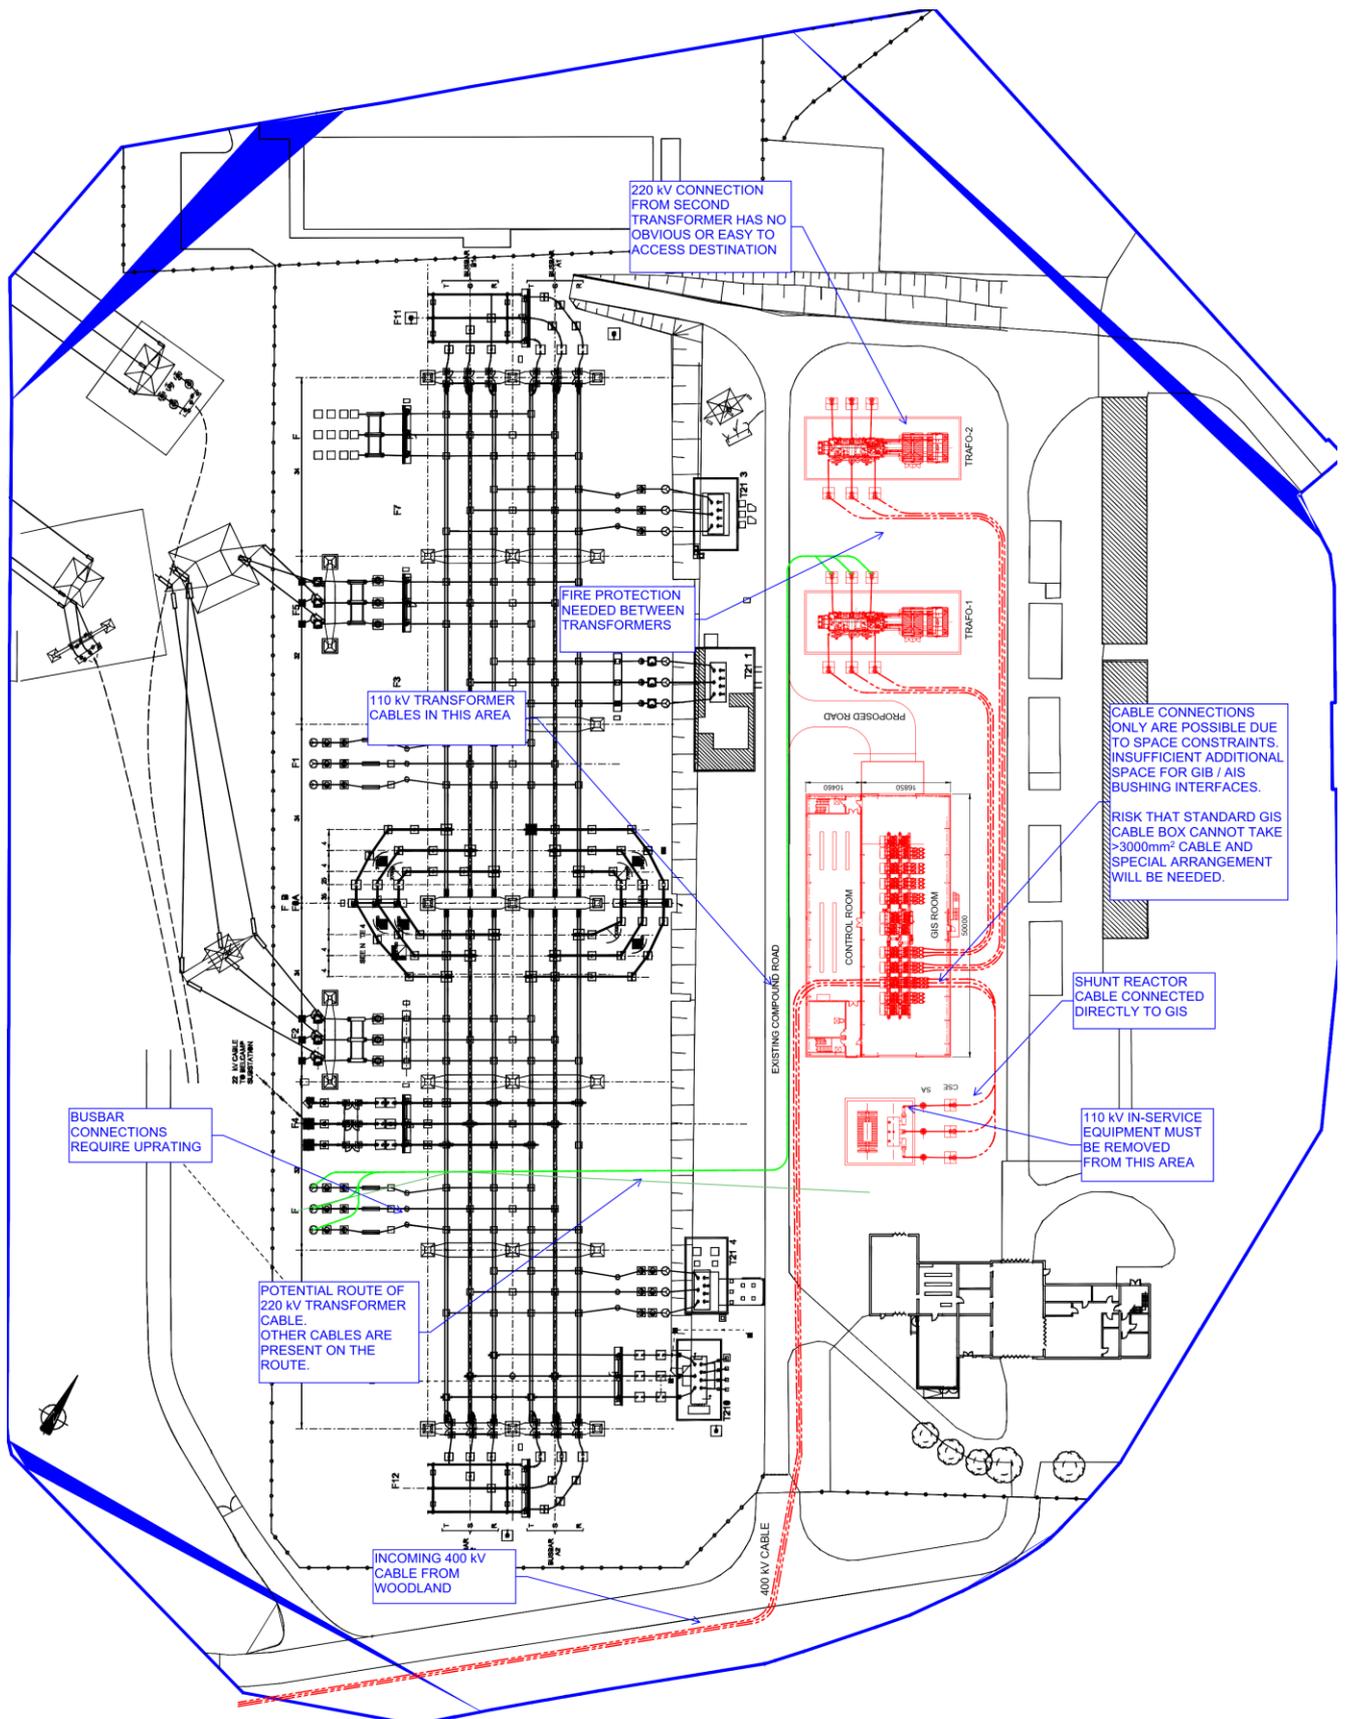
Finglas 400 kV layout option – Underground Cable
